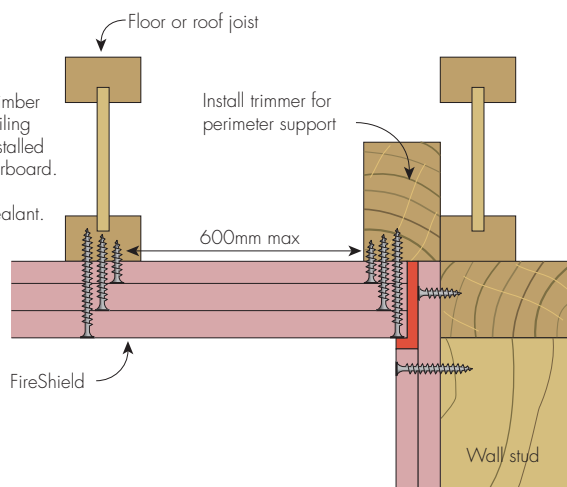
Fire Rated Ceiling to Wall – Alternate Detail
